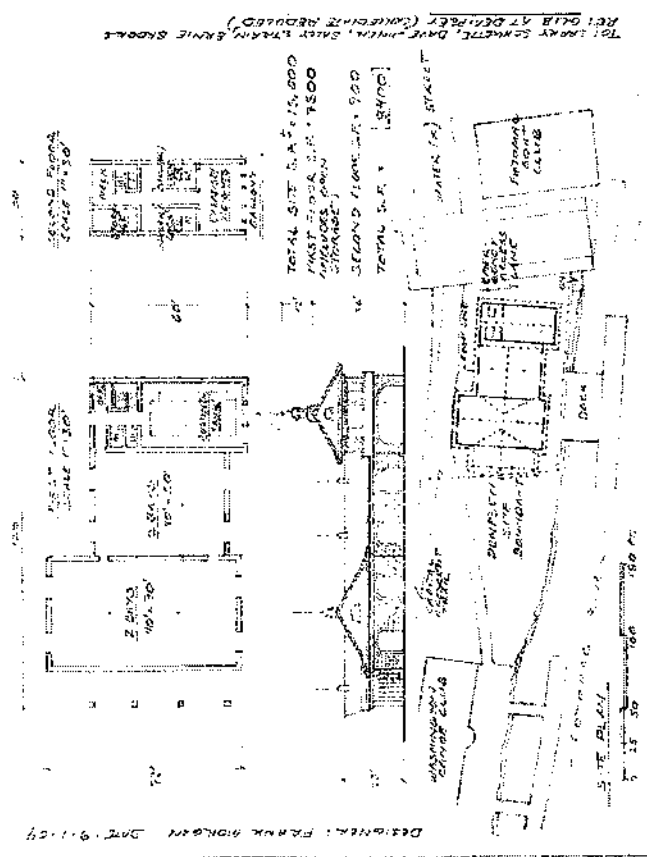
h Street: The Georgetown Universal Boathouse
